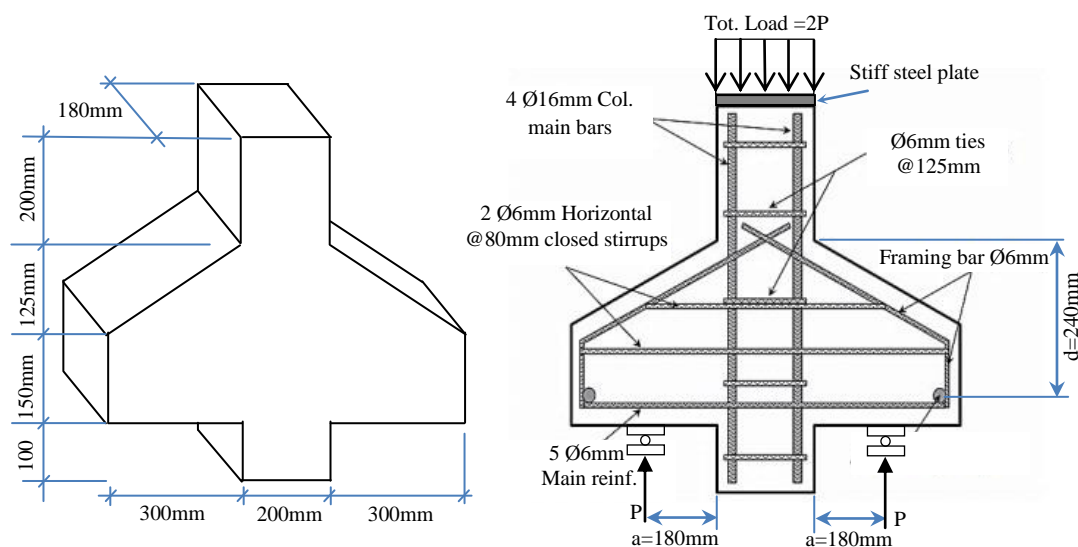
Details of the Reinforced Concrete Corbels Tested by AL-Nasrawi [7]
